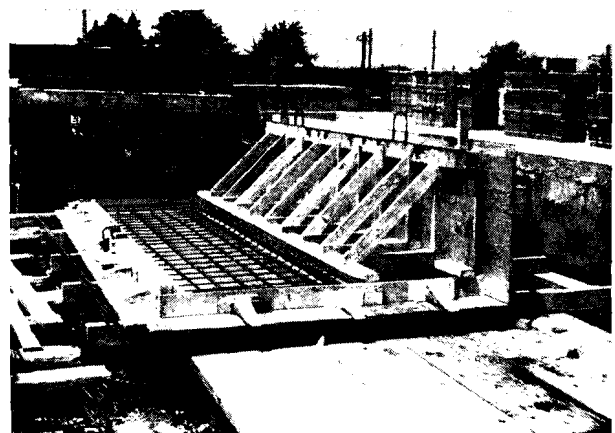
Formwork used for prefabrication of balcony slab with balustrade.
